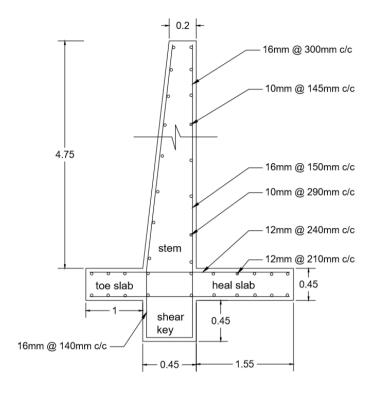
Cantilever retaining wall (Reinforcement details cross section)
